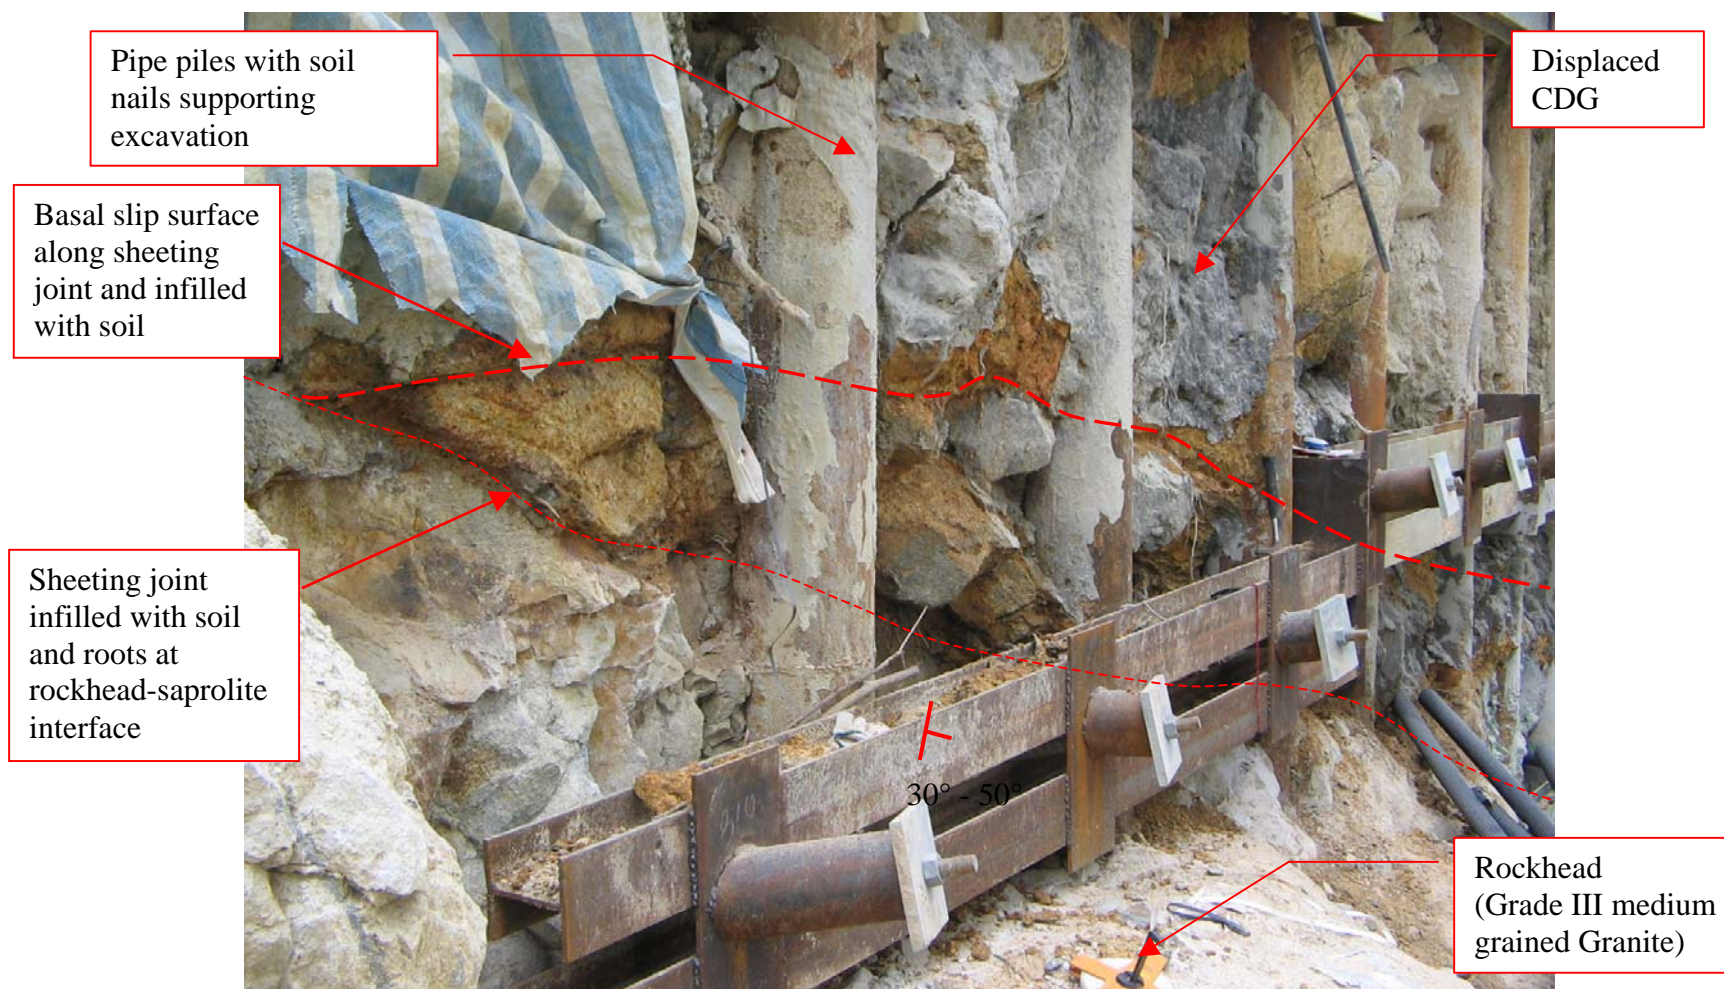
View of the Basal Slip Surface and Sheeting Joint above Rockhead in the Excavation for LPM Works
